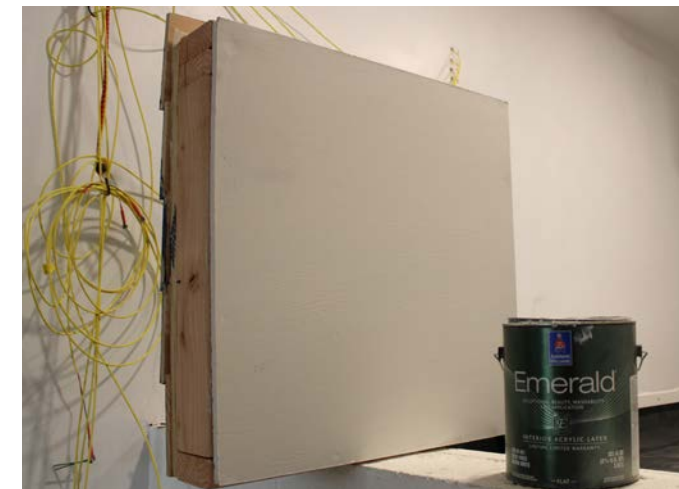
Sample 3 wall assembly of Modern Drywall (from top to bottom): “interior” drywall, assembly section, “exterior” siding
